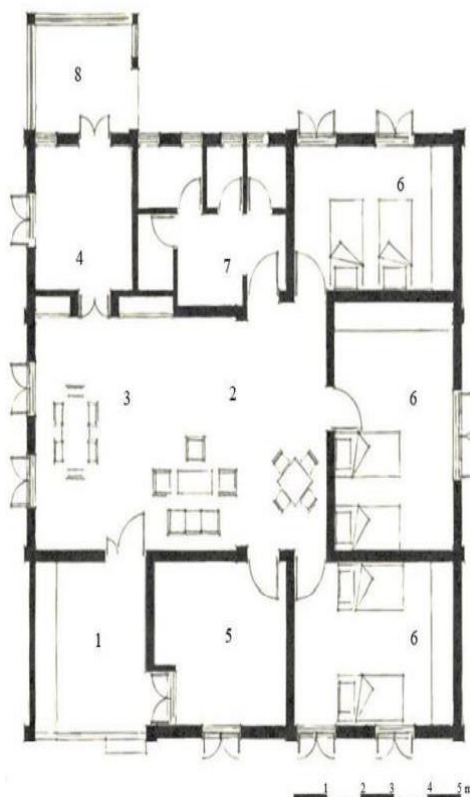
Plan of House – SOS Children's Village- Piliyandala [Drawing](Source –By Author)
